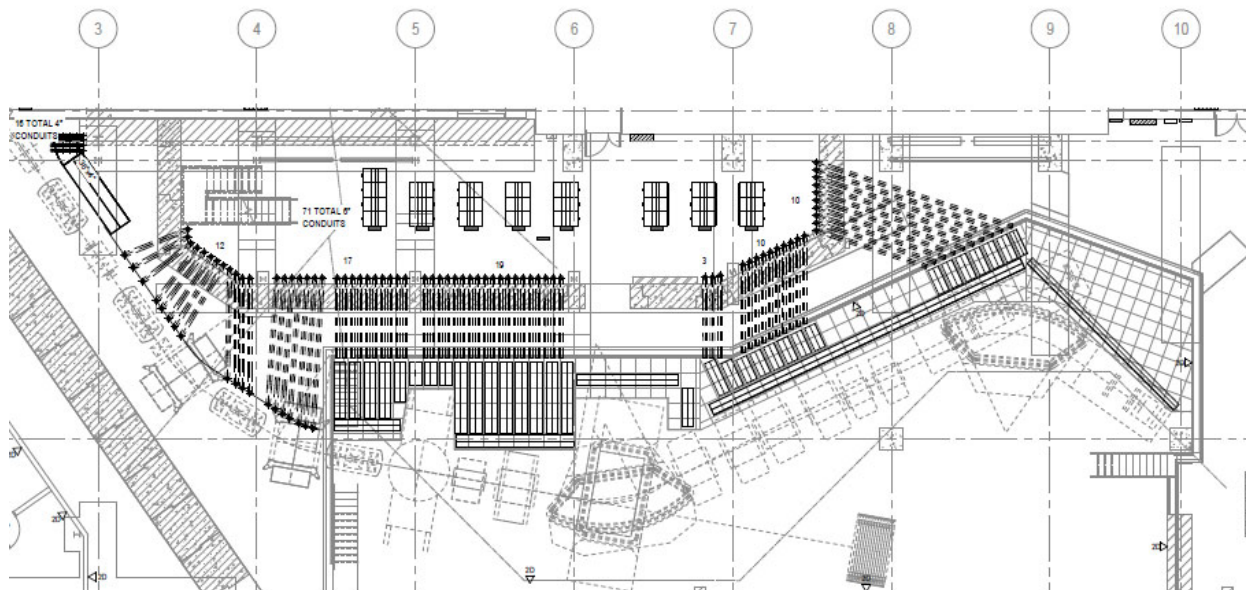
Layout of conduits from equipment racks to the HTBL and Spectrometer Section of the HRS.
